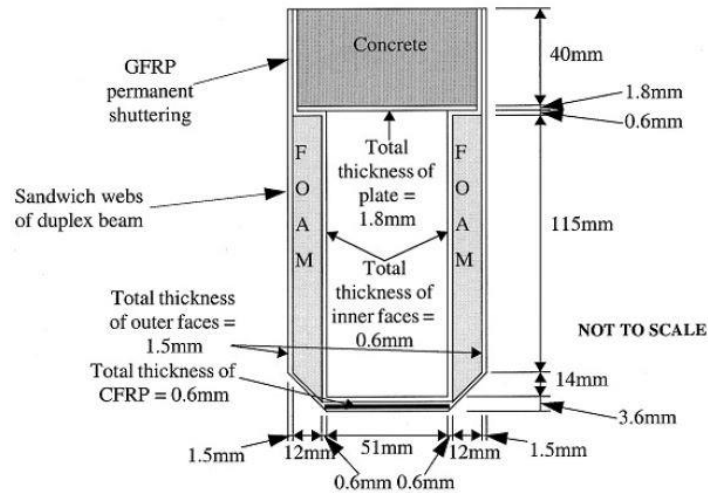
Partially filled FRP profile as bridge girder (Zhao, 2017)
